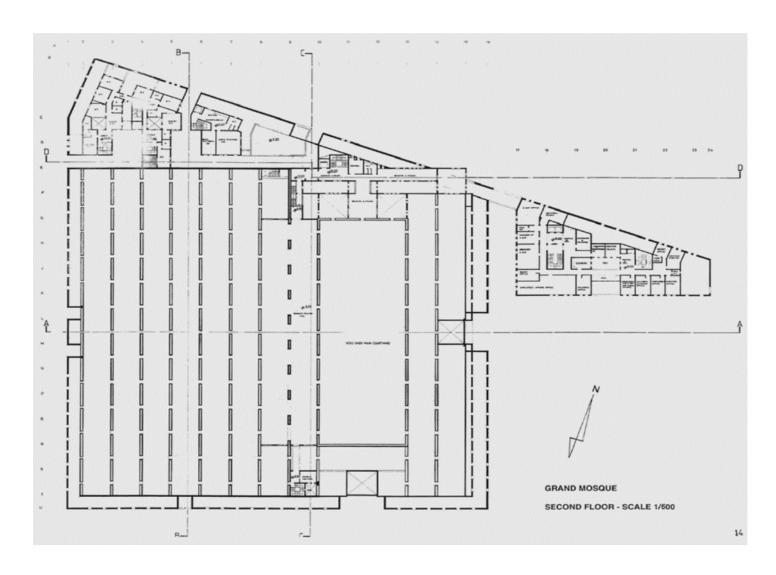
Second floor plan. Source: (ibid, 2013. p.14).
